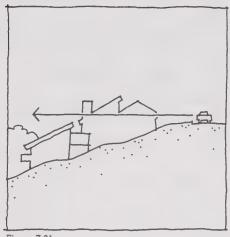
Where feasible, site the mass of downslope buildings below street level to maintain views.
